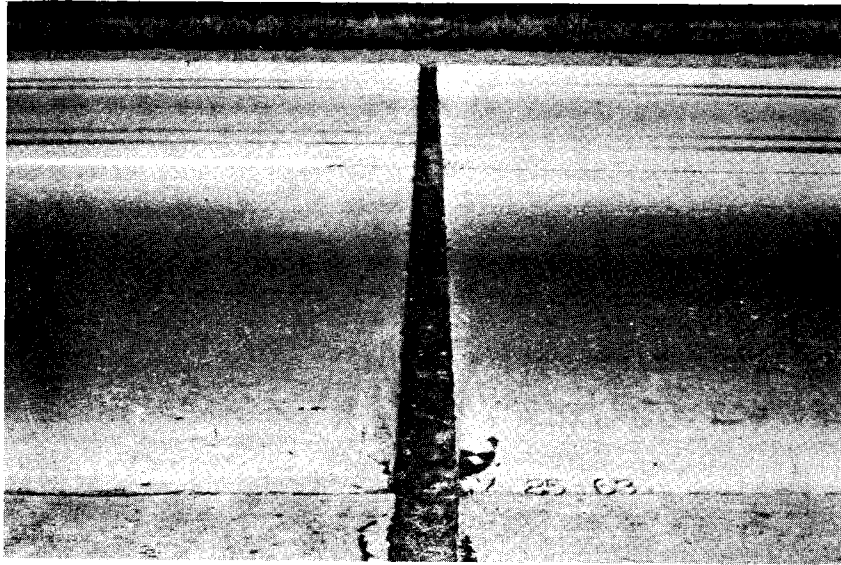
Joint next to bridge protection expansion joint type XJ-1.
